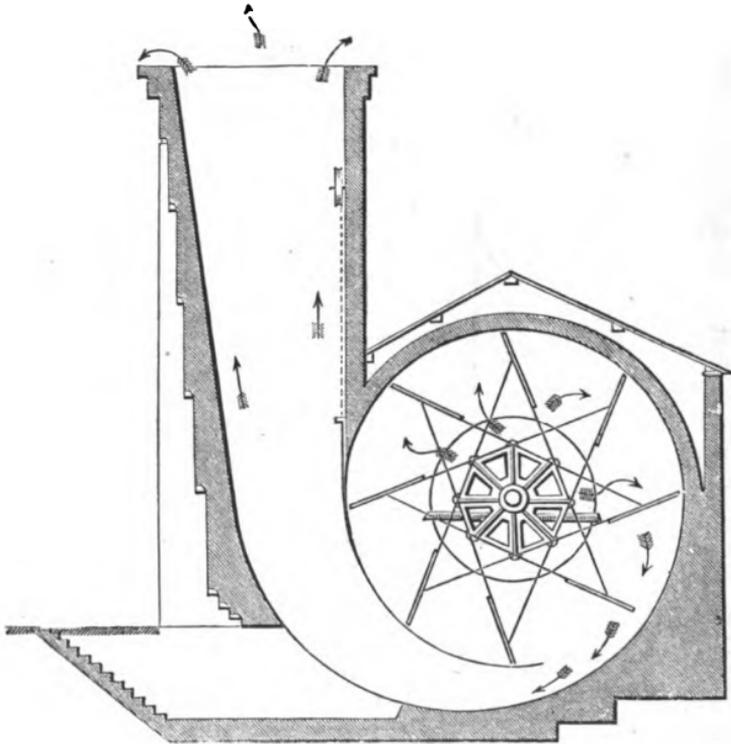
Guibal's Ventilating Fan. Scale—1 inch to 20 feet.
